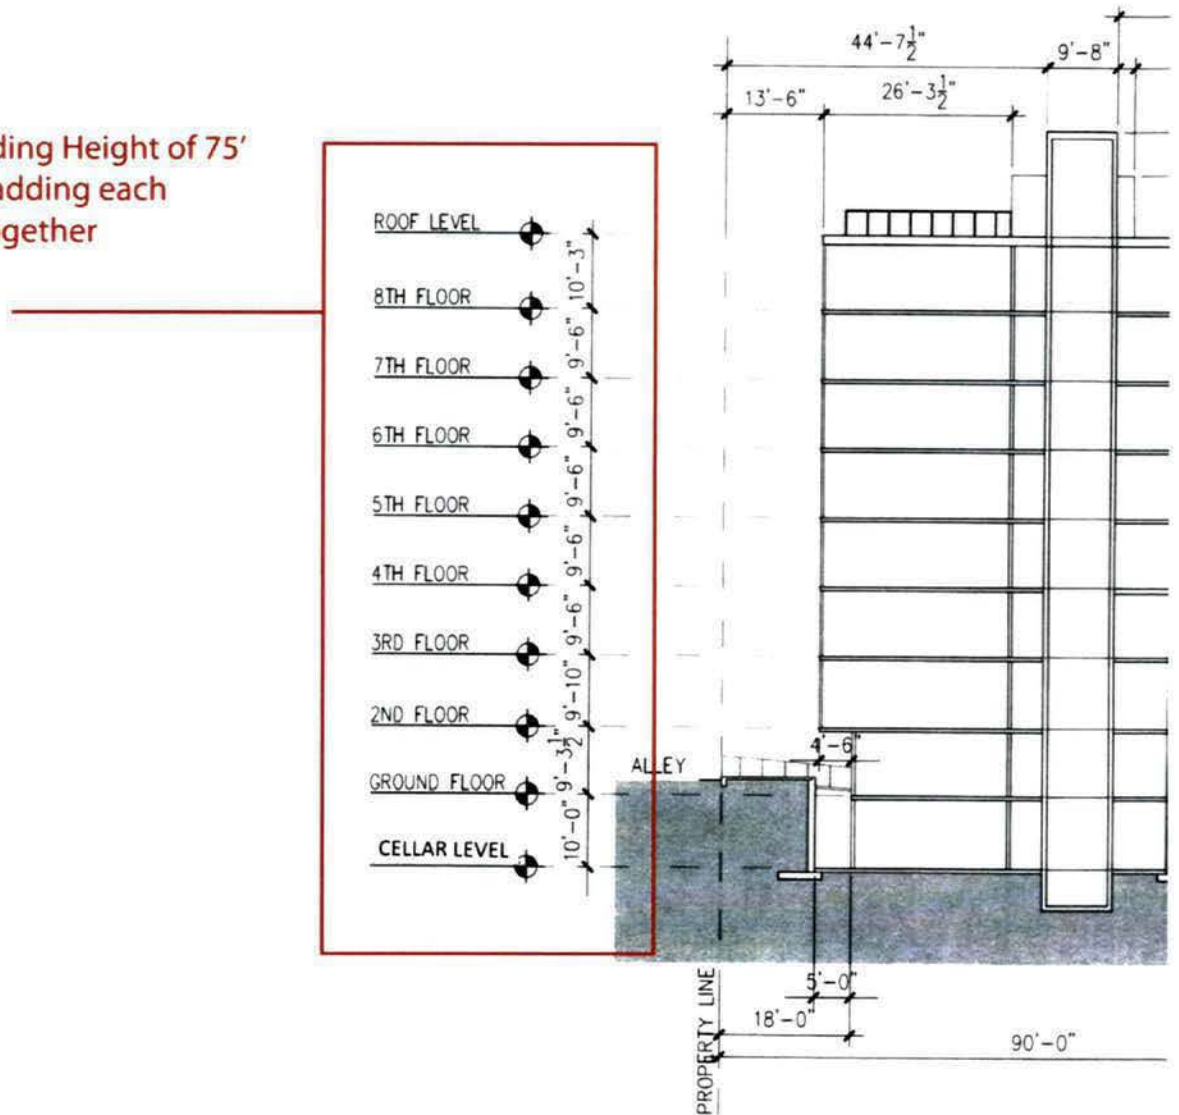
Elevation from Applicant's Elevation Plans showing Seventy-Five (75) Feet Height of Building as well as implication that it is the same height as the existing adjacent condominium on Church Street
